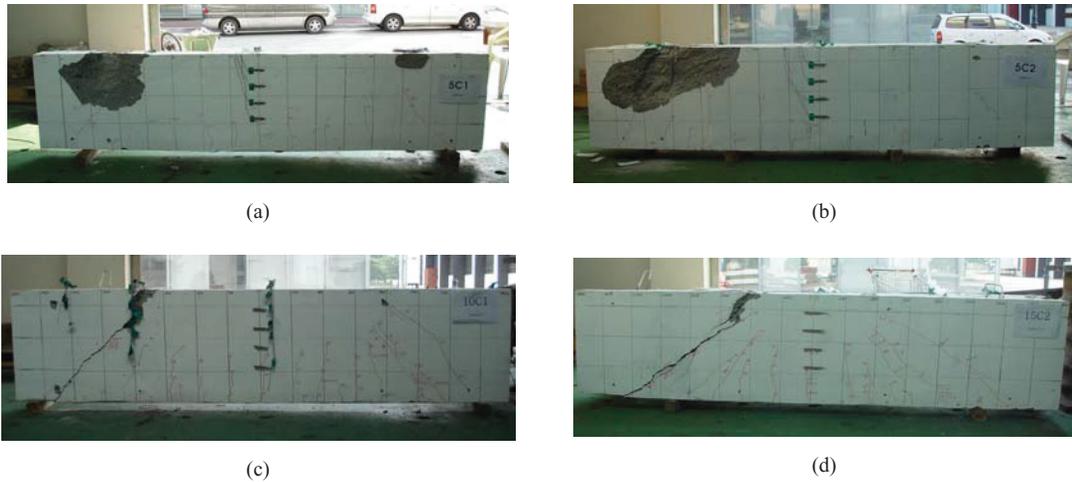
Failure of tested beams; (a) 5C1, (b) 5C2, (c) 10C1, and (d) 15C2.
